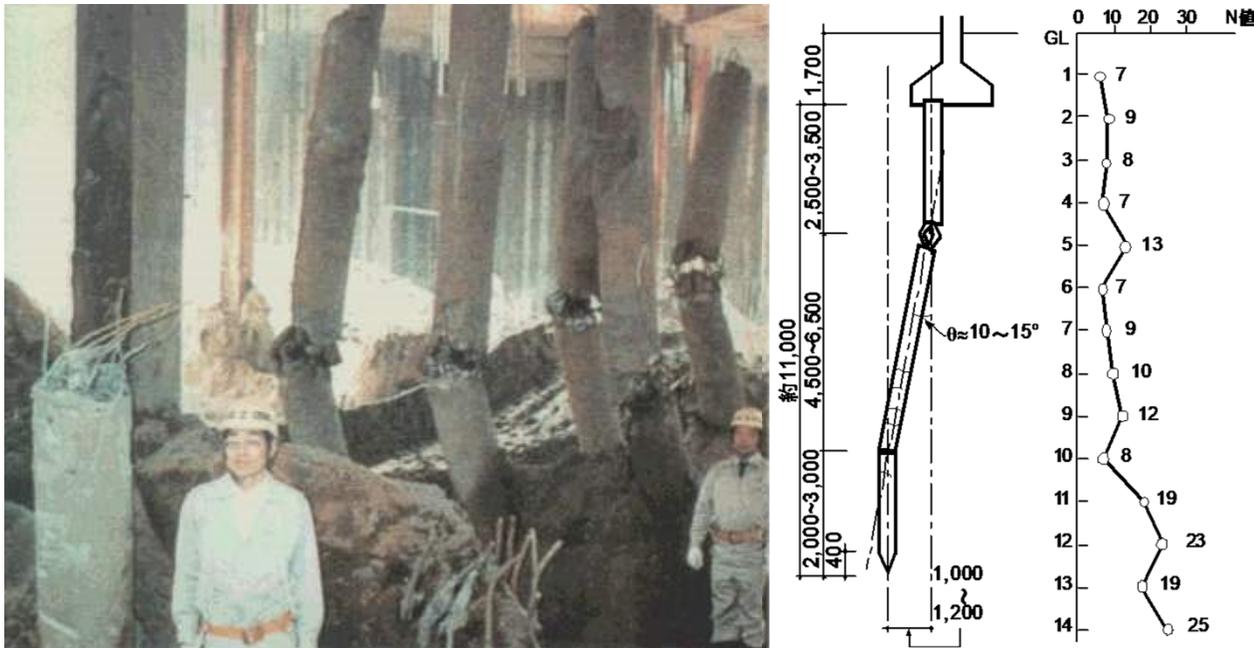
Earthquake Damage Case of Pile Foundation Building
